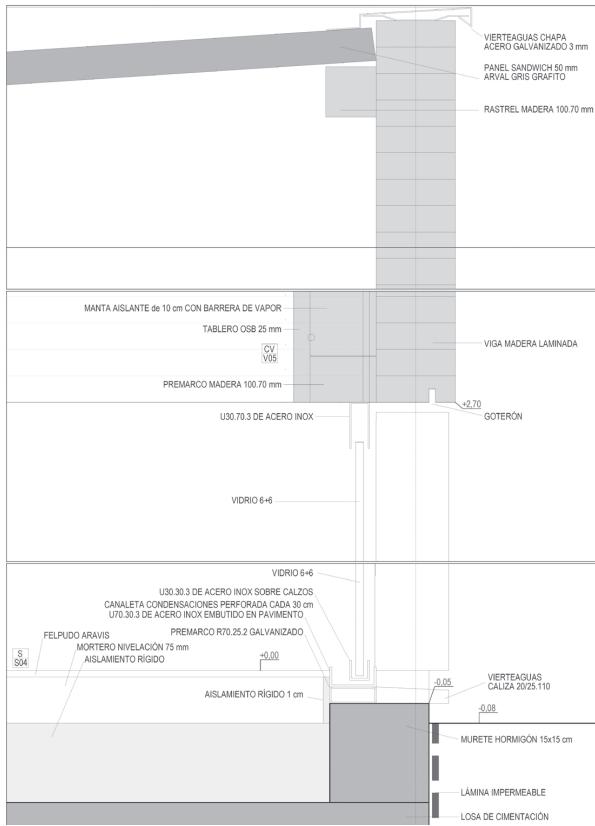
Detail plan. 2018. ©amas4arquitectura / Figura 6. Plano de detalle. 2018. ©amas4arquitectura.
